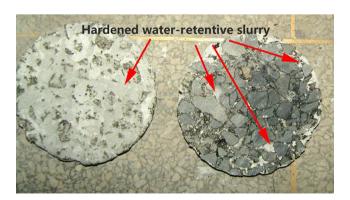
Water-retentive asphalt concrete specimens, surface (left) and cut section (right).
